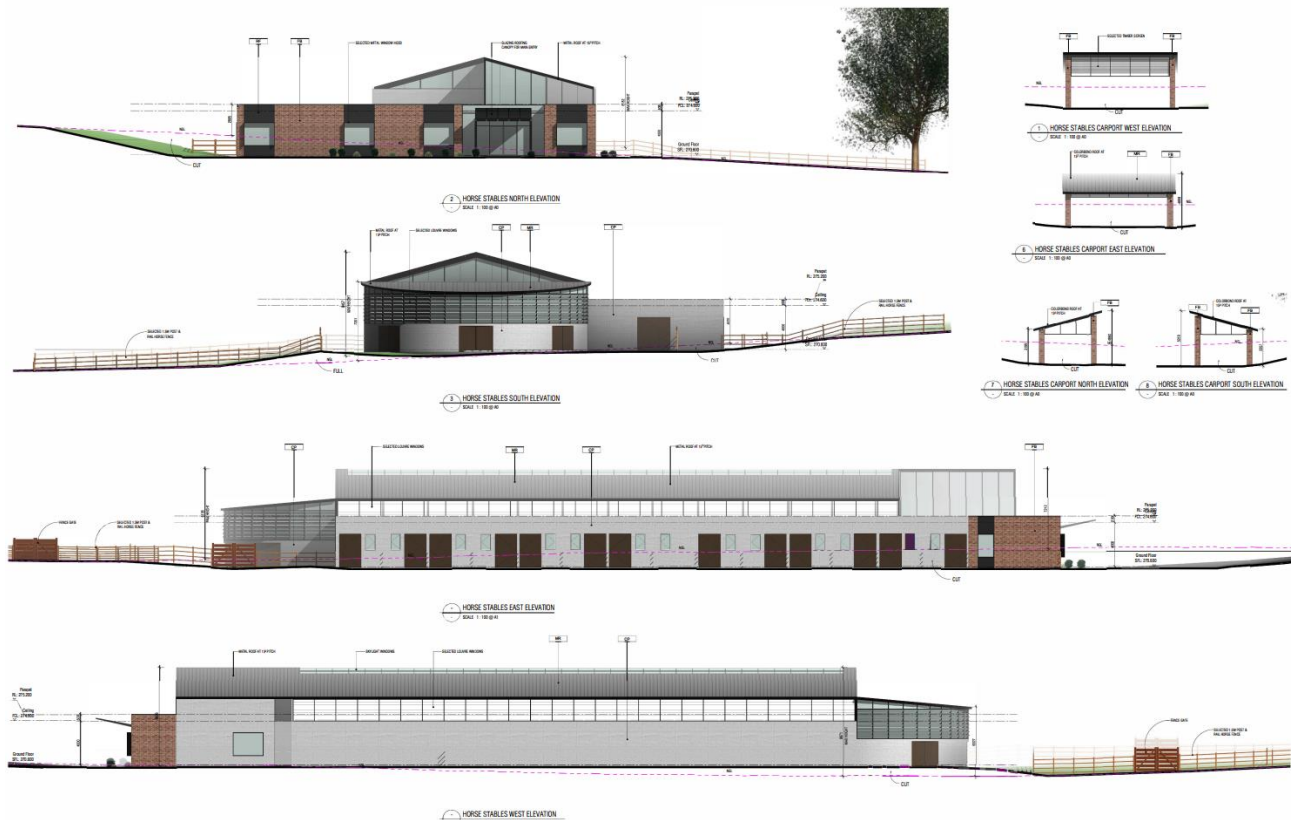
Elevation plans of proposed horse husbandry building/stables.
